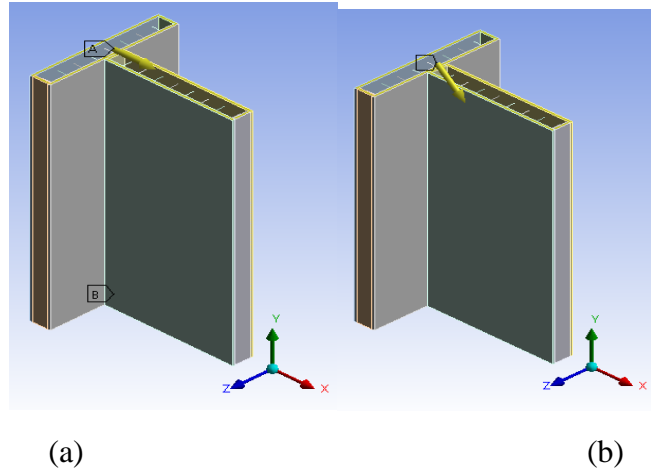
Loading conditions of T-shaped SSCPW a) Loading under pure shear b) Loading under compression shear.
